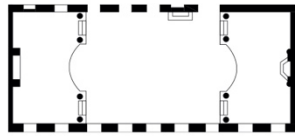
Room typical floor plan and graphic analysis of the Hotel Pennsylvania. New York. Architects McKim, Mead & White. 1919
